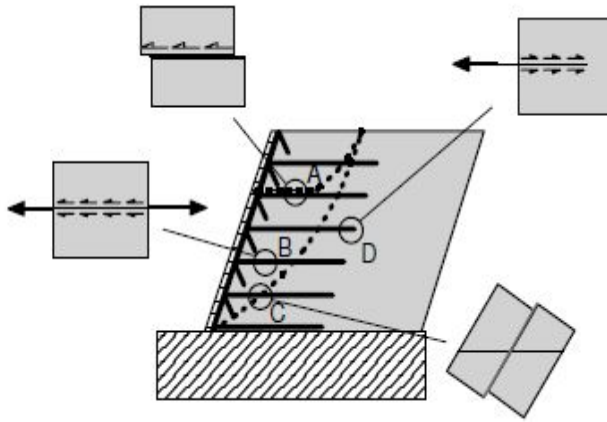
Interaction mechanisms in a reinforced wall, (Palmeira, 2009)
